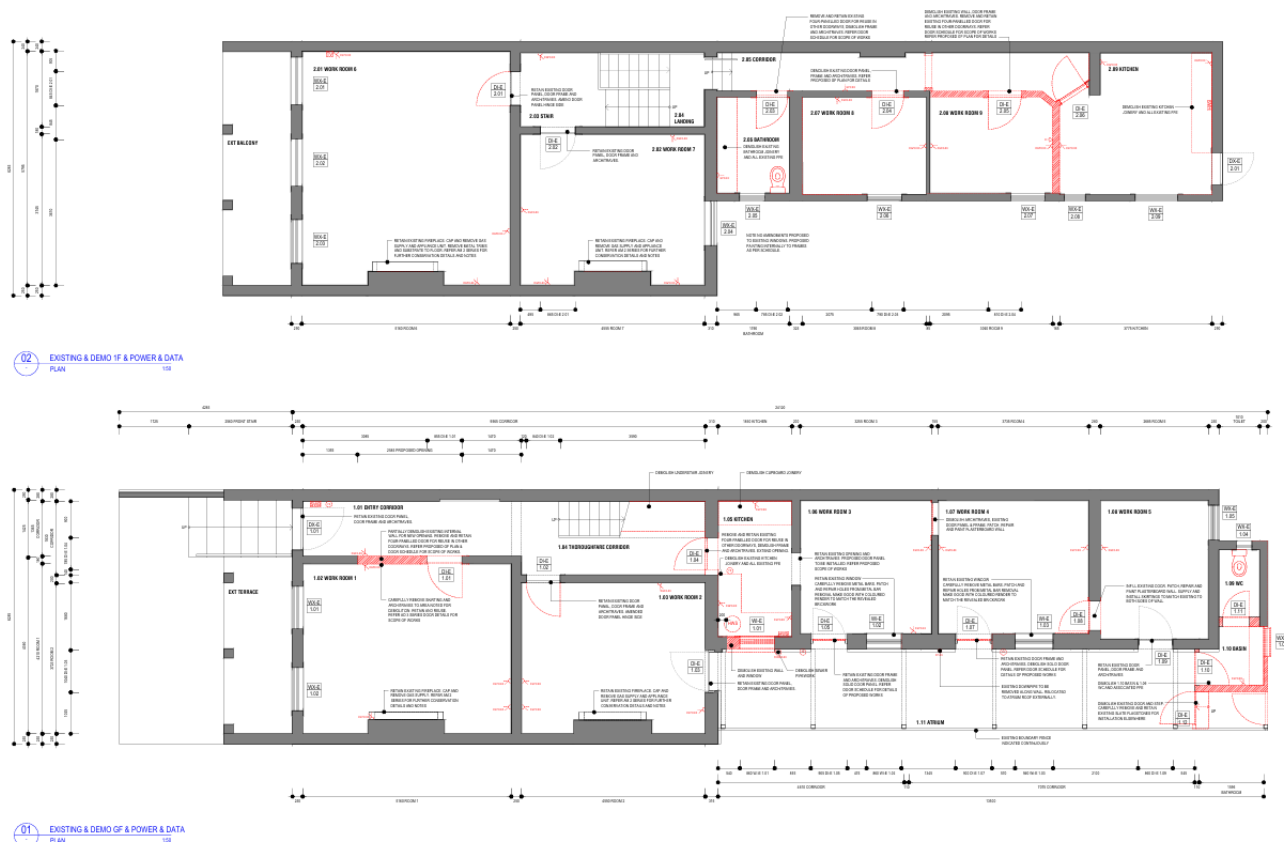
Drawing AE 1.01 indicates the main areas of proposed demolition to ground and first floor, shown in red (Studio C + E)
